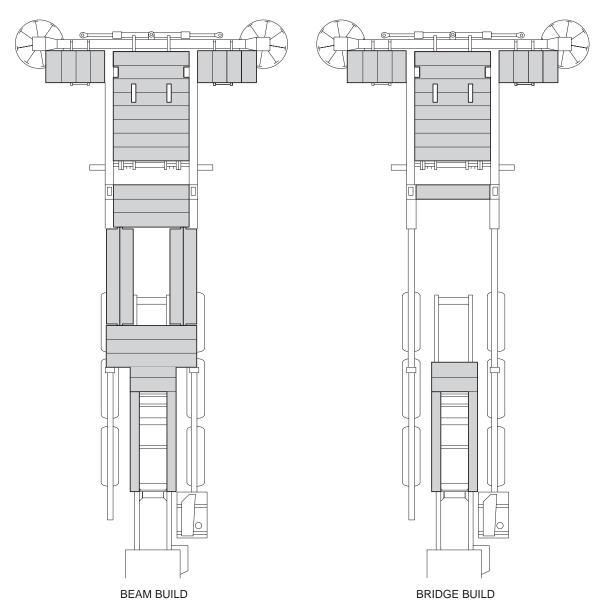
16 Walkway Positions for Beam and Bridge Build
